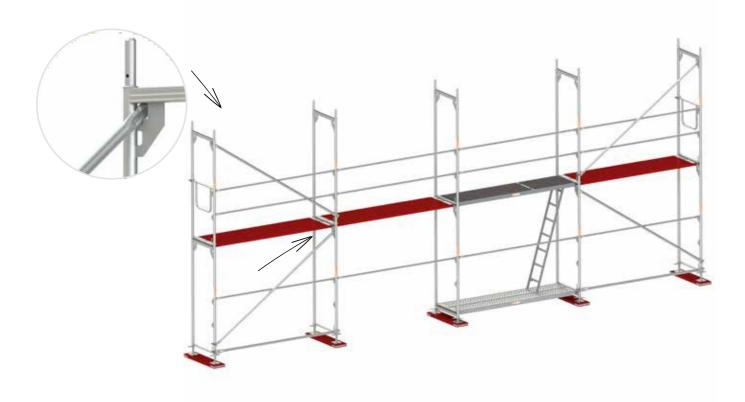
Installation of the consecutive frames and handrails for the second storey.
